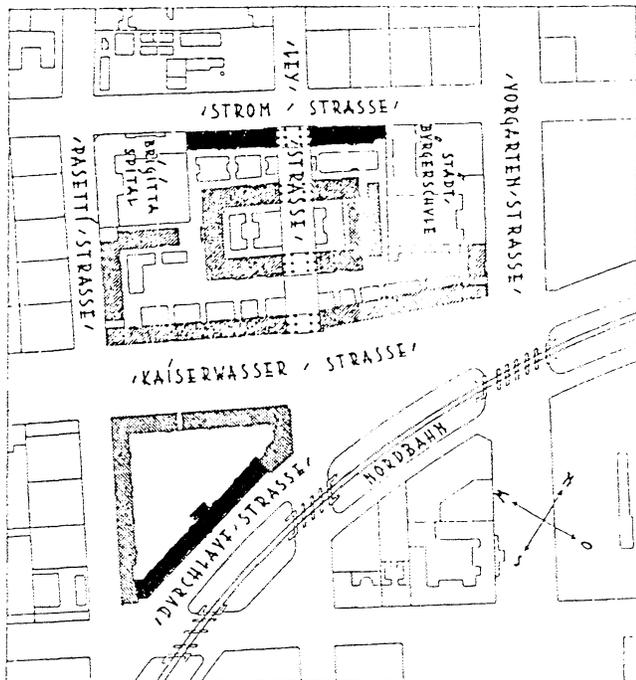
Site Plan of the Otto Haas-Hof and general vicinity. Otto Haas-Hof at right and Behrens building at left. Drawing credit Vienna Rossa, edited by Manfredo Tafuri. Milan: Electa Edifice, 1980.
